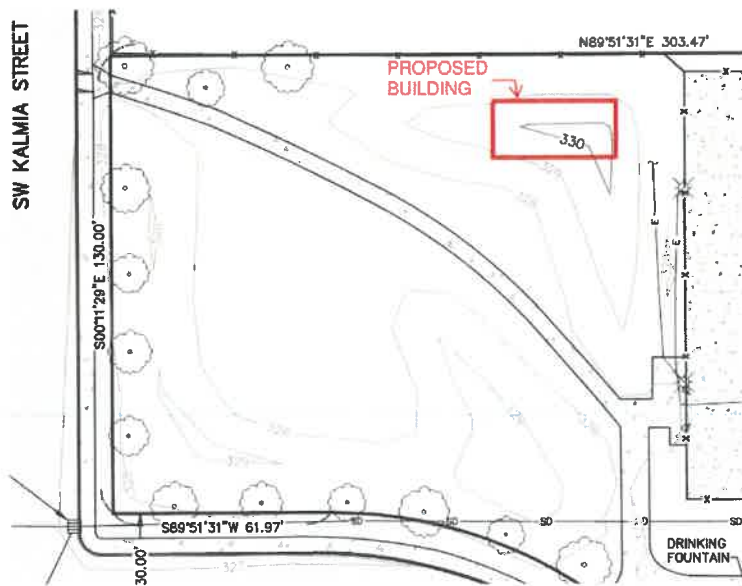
Bailey Park Topographic Survey with Proposed Building Location
